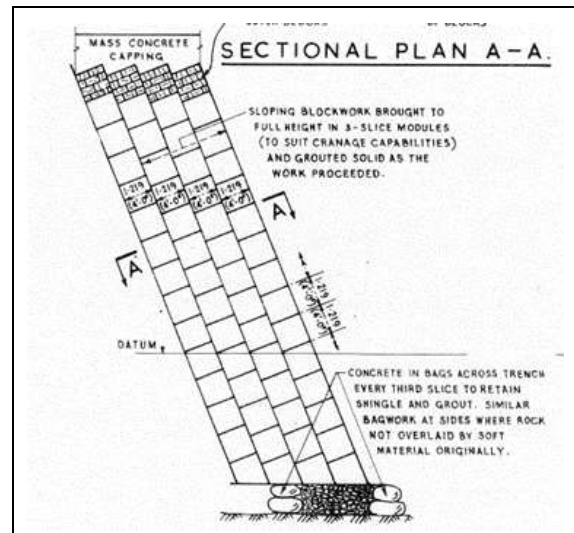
Slice blockwork extending the Hermitage Breakwater in 1887-88
